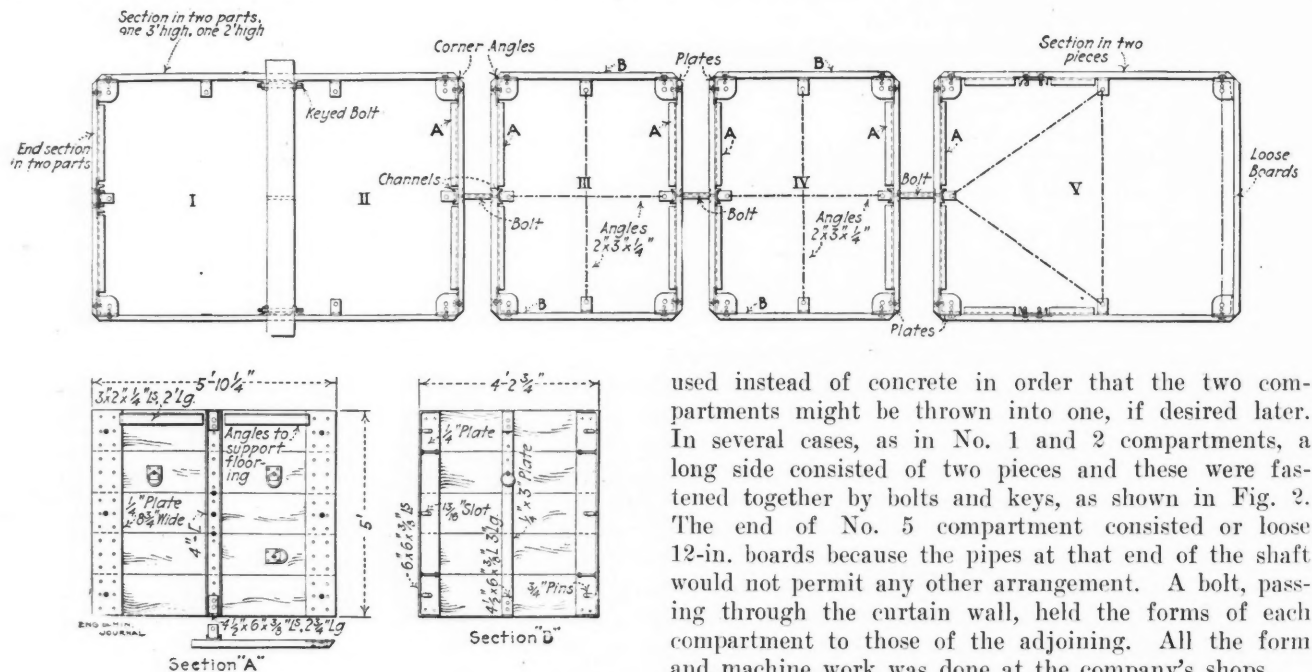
ARRANGEMENT OF THE FORMS IN THE SHAFT AND DETAILS OF TWO SECTIONS
